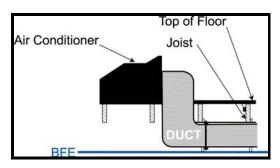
A properly elevated building has all damageable items, including floor joists, air conditioner, and ductwork, above the base flood elevation (BFE); the ductwork could also be run overhead, through the attic.
